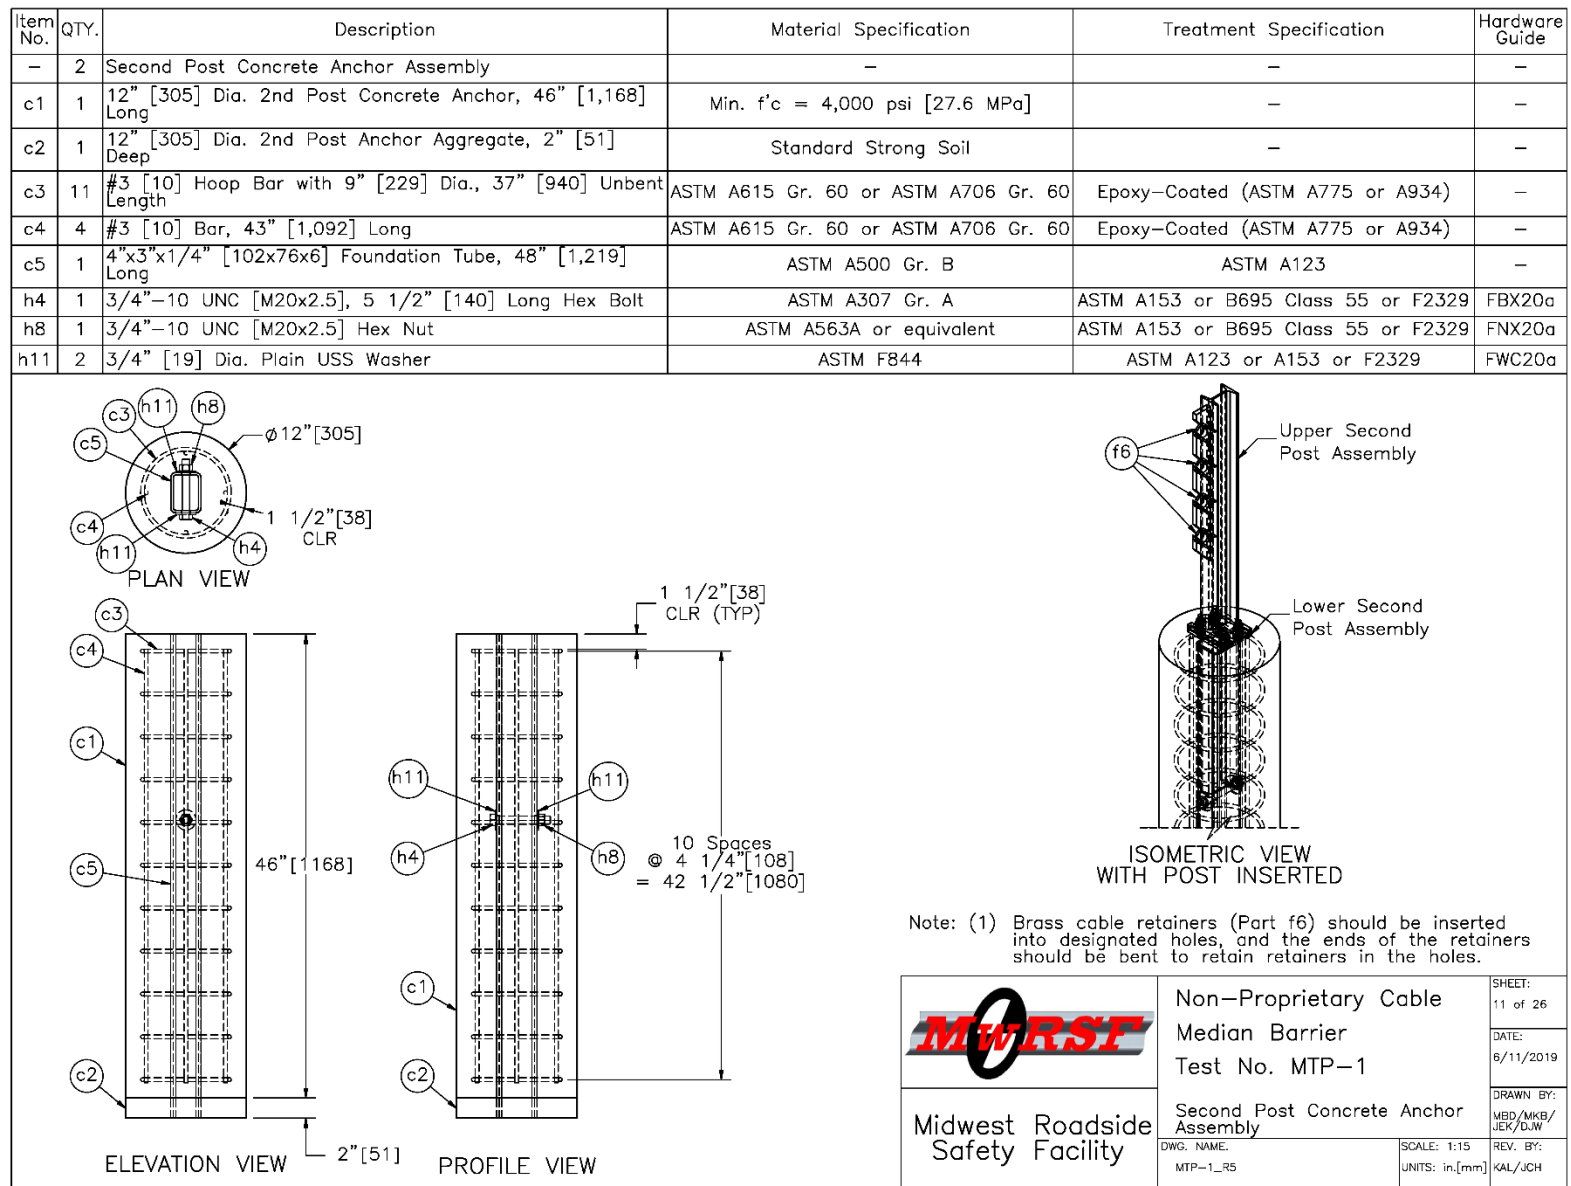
Second Post Concrete Anchor Assembly, Test No. MTP-1
